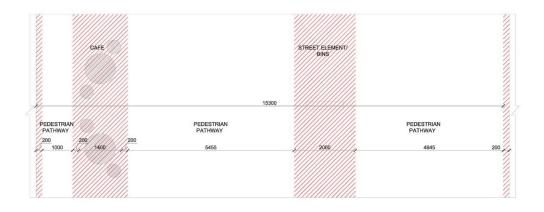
Street width and buffer spaces (in mm) for Gateway 9 in the area surrounding Hauptwache in Frankfurt am Main
